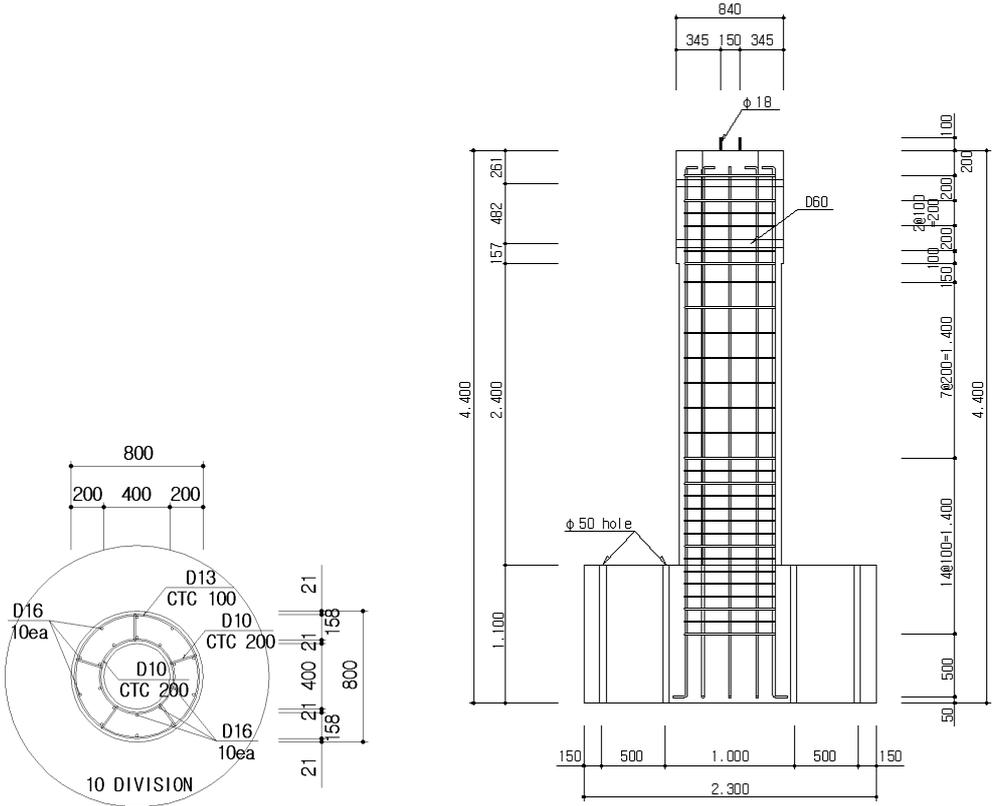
Sample of test specimens HC-O-100 (Unit: mm)
